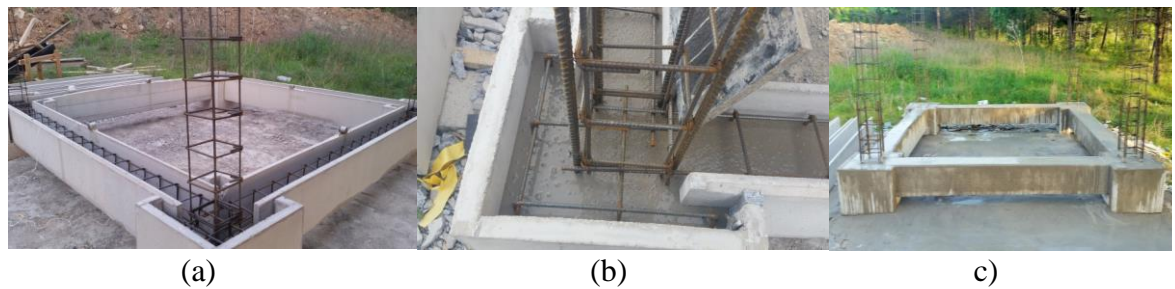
Pouring concrete into the RC formworks. (a) Formwork installation (b) Pouring concrete c) Product.
